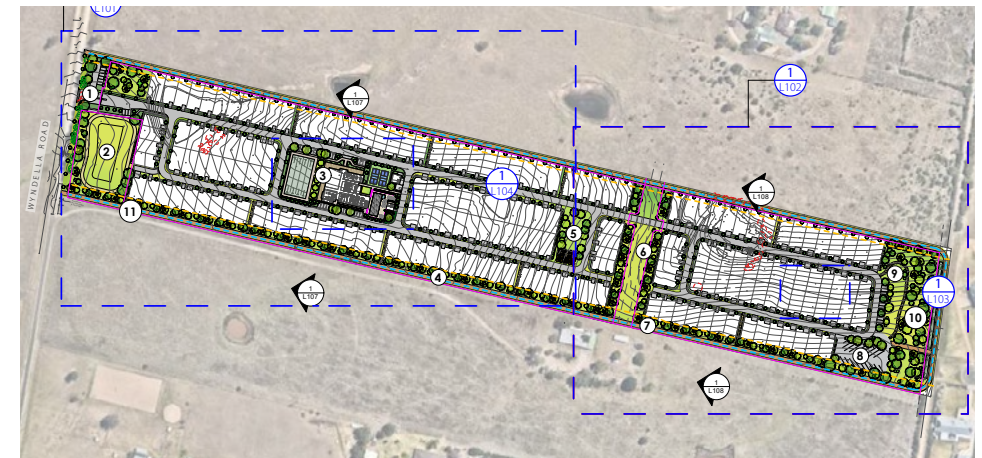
Landscape Site Plan, Maitland MHE, Revision P, Terras Landscape Architects
